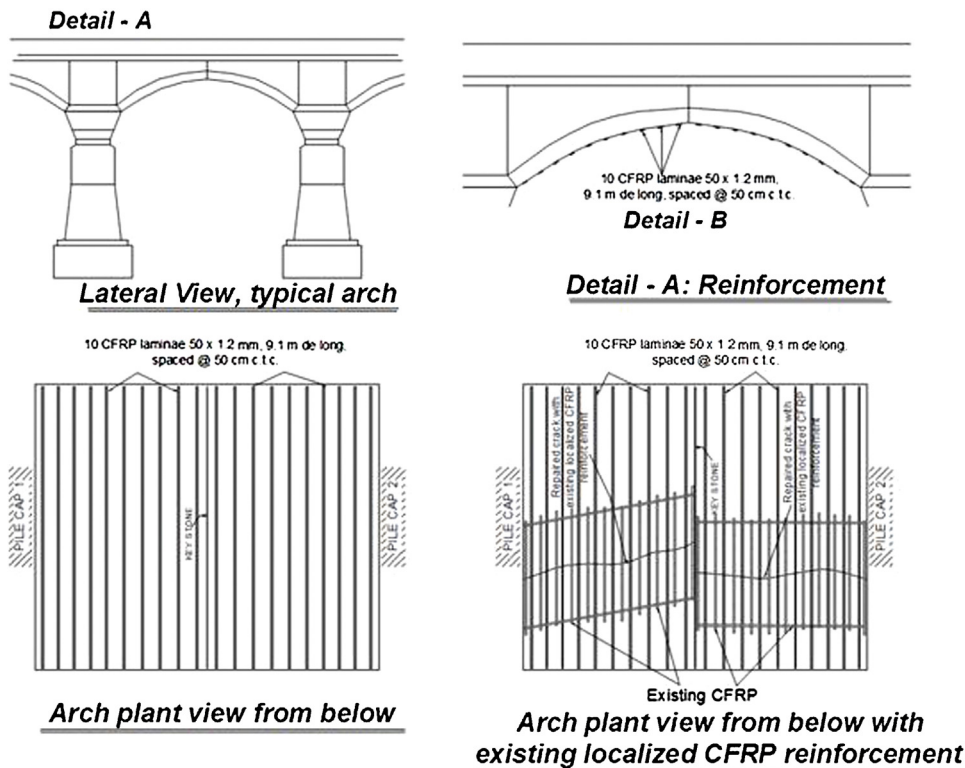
CFRP reinforcement of the cracked arches at the entire arch width. (a) Arch without previous reinforcement, (b) arch previously reinforced with localized CFRP strips.
